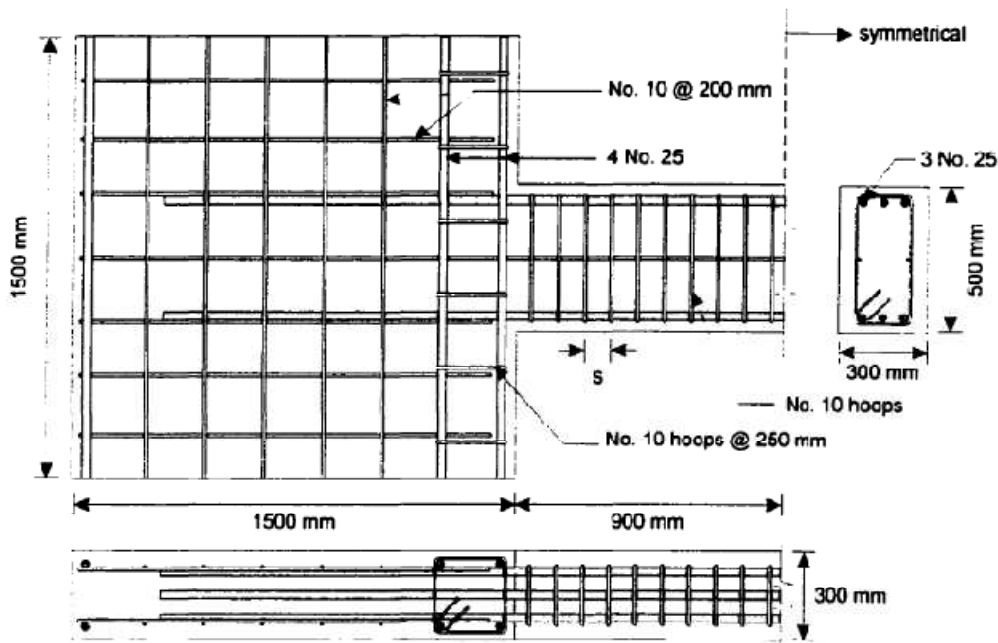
Section and Reinforcement Details of Specimen NR4 (Bristowe 2000)
